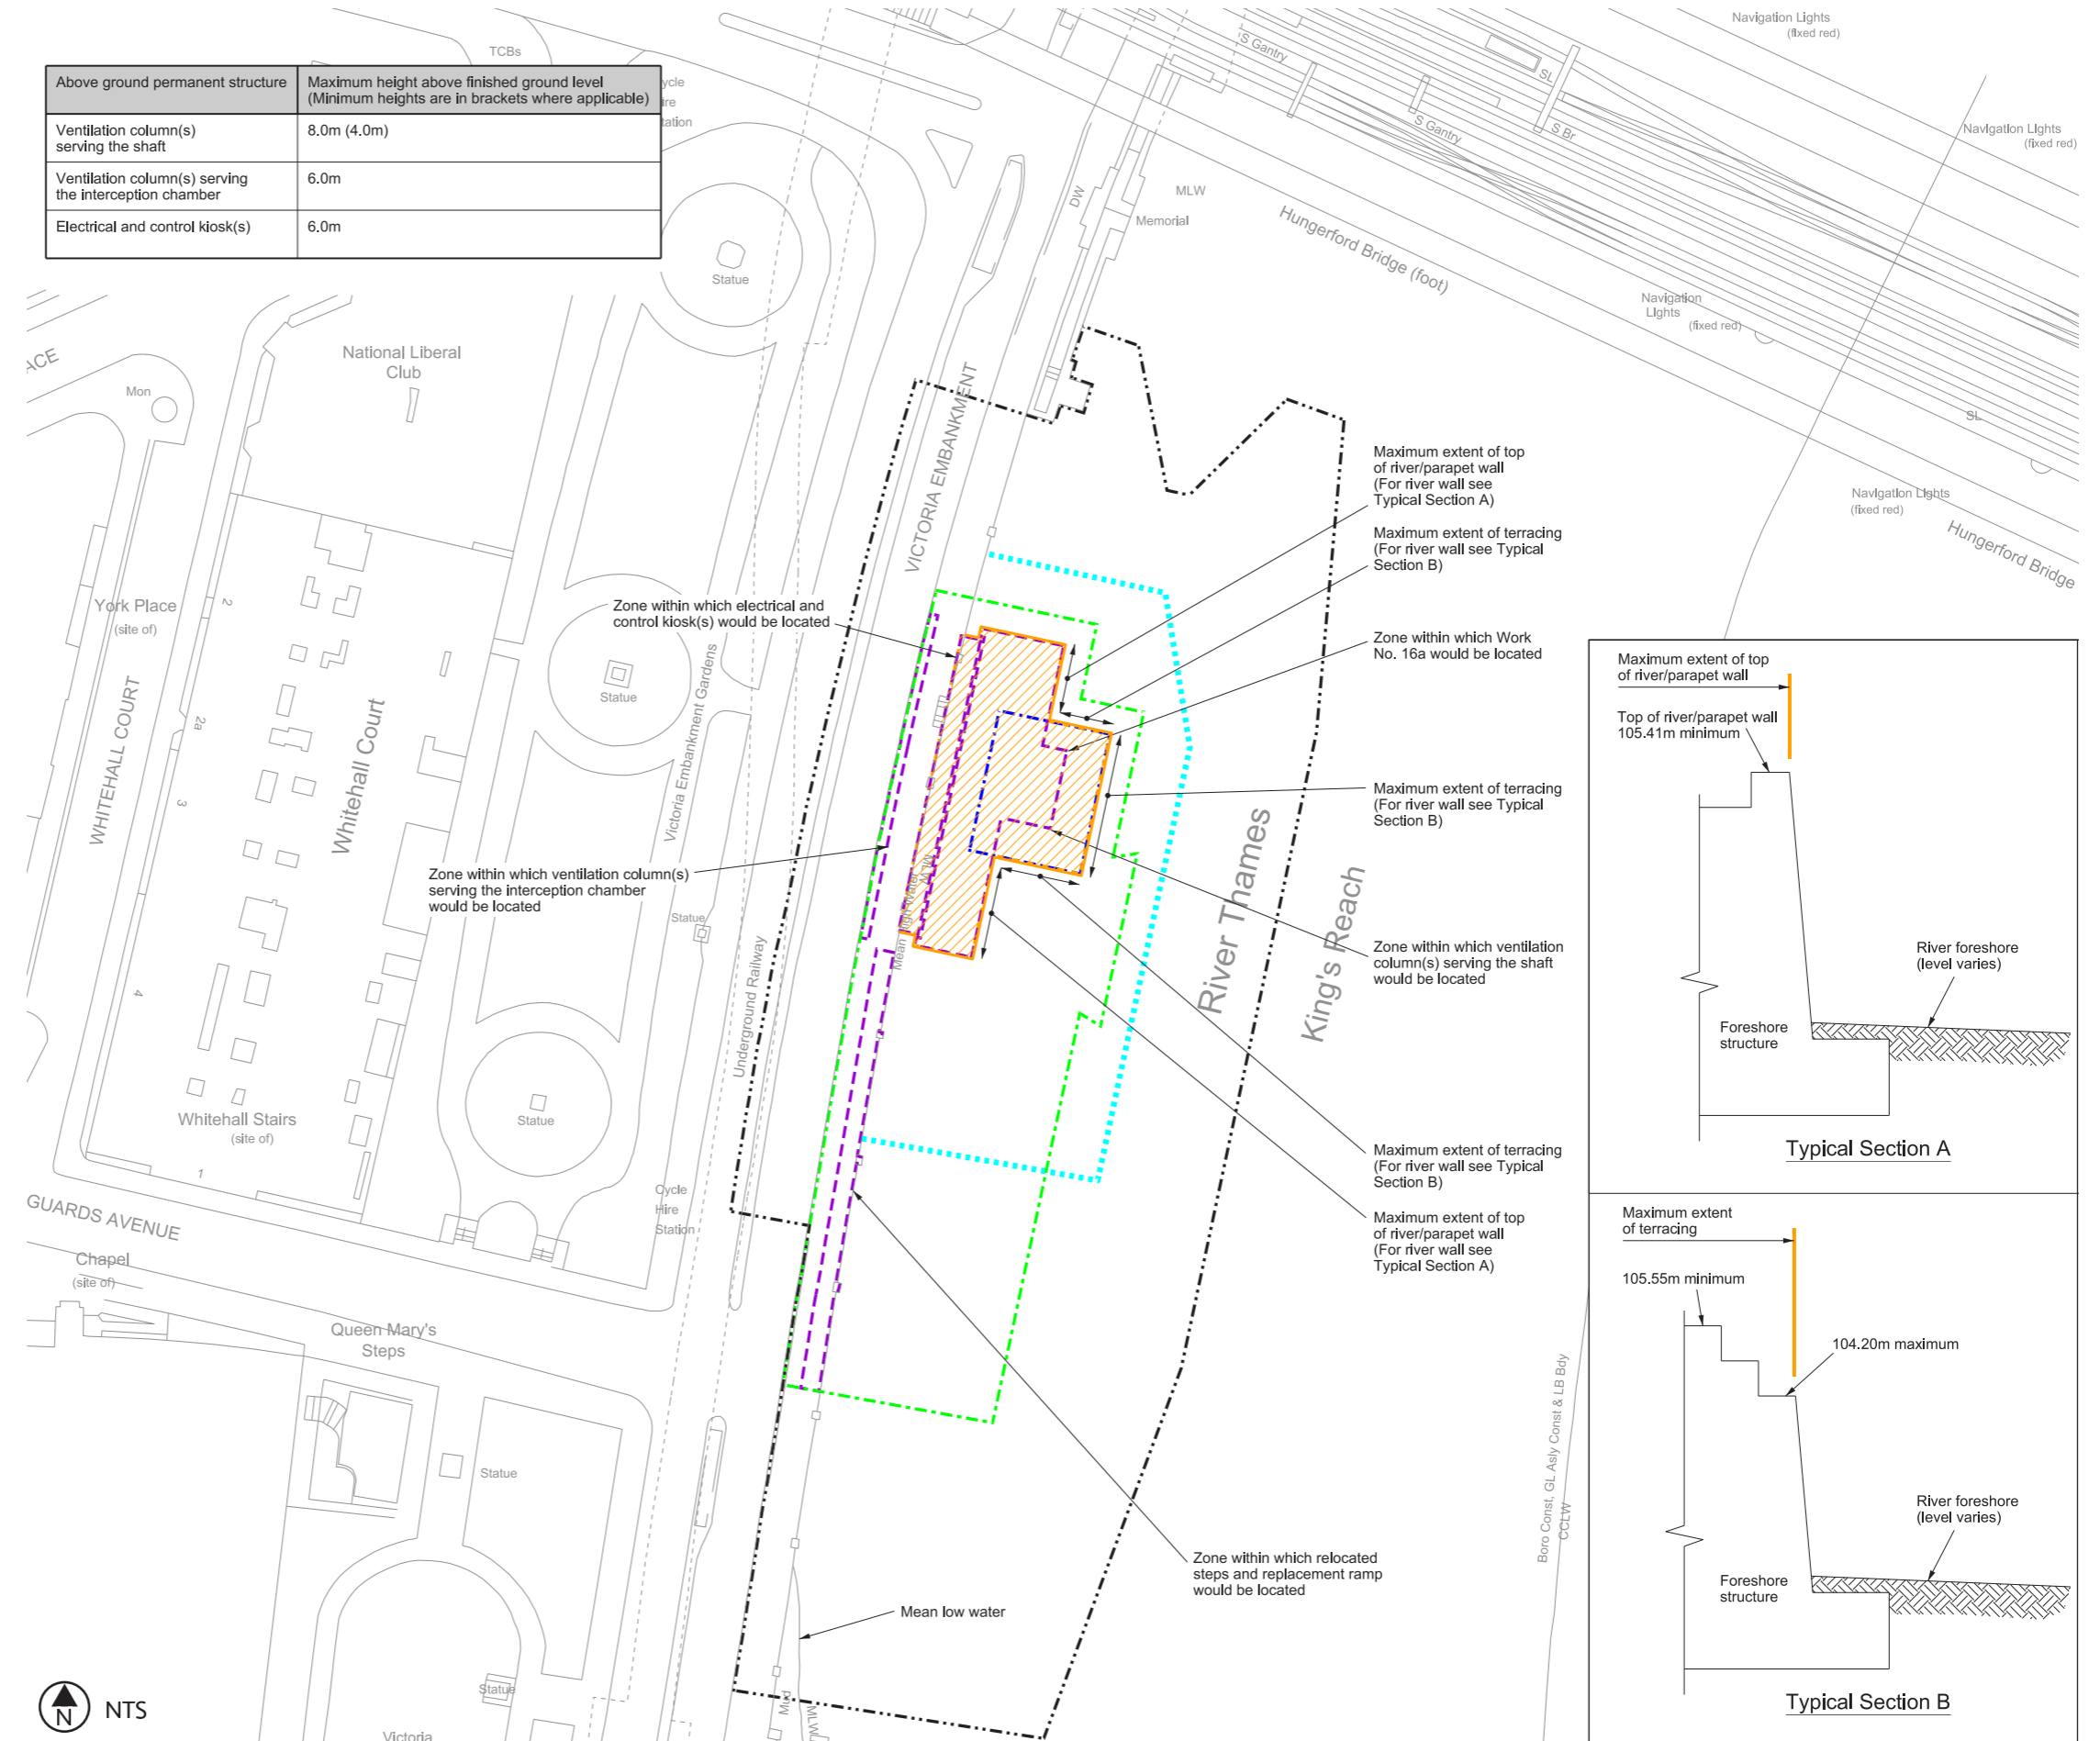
Proposed site works parameter plan - refer to Site works parameter plan in the *Book of Plans
